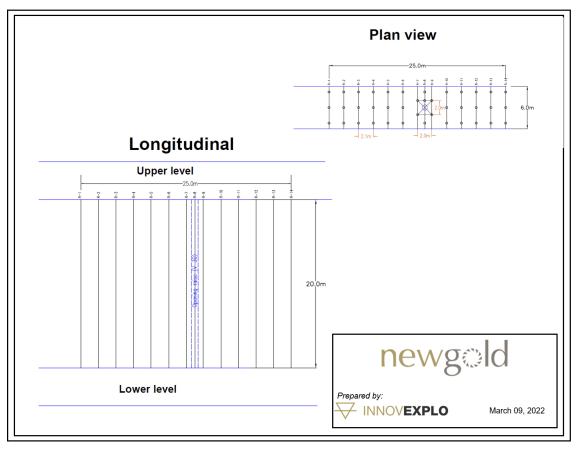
Drill and Blast - Longitudinal and Plan View
